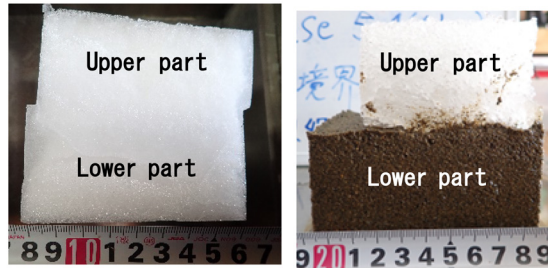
Examples of test specimens after constant-pressure direct box shear test (Left: Test case S-1, Right: Test case SG-2)
